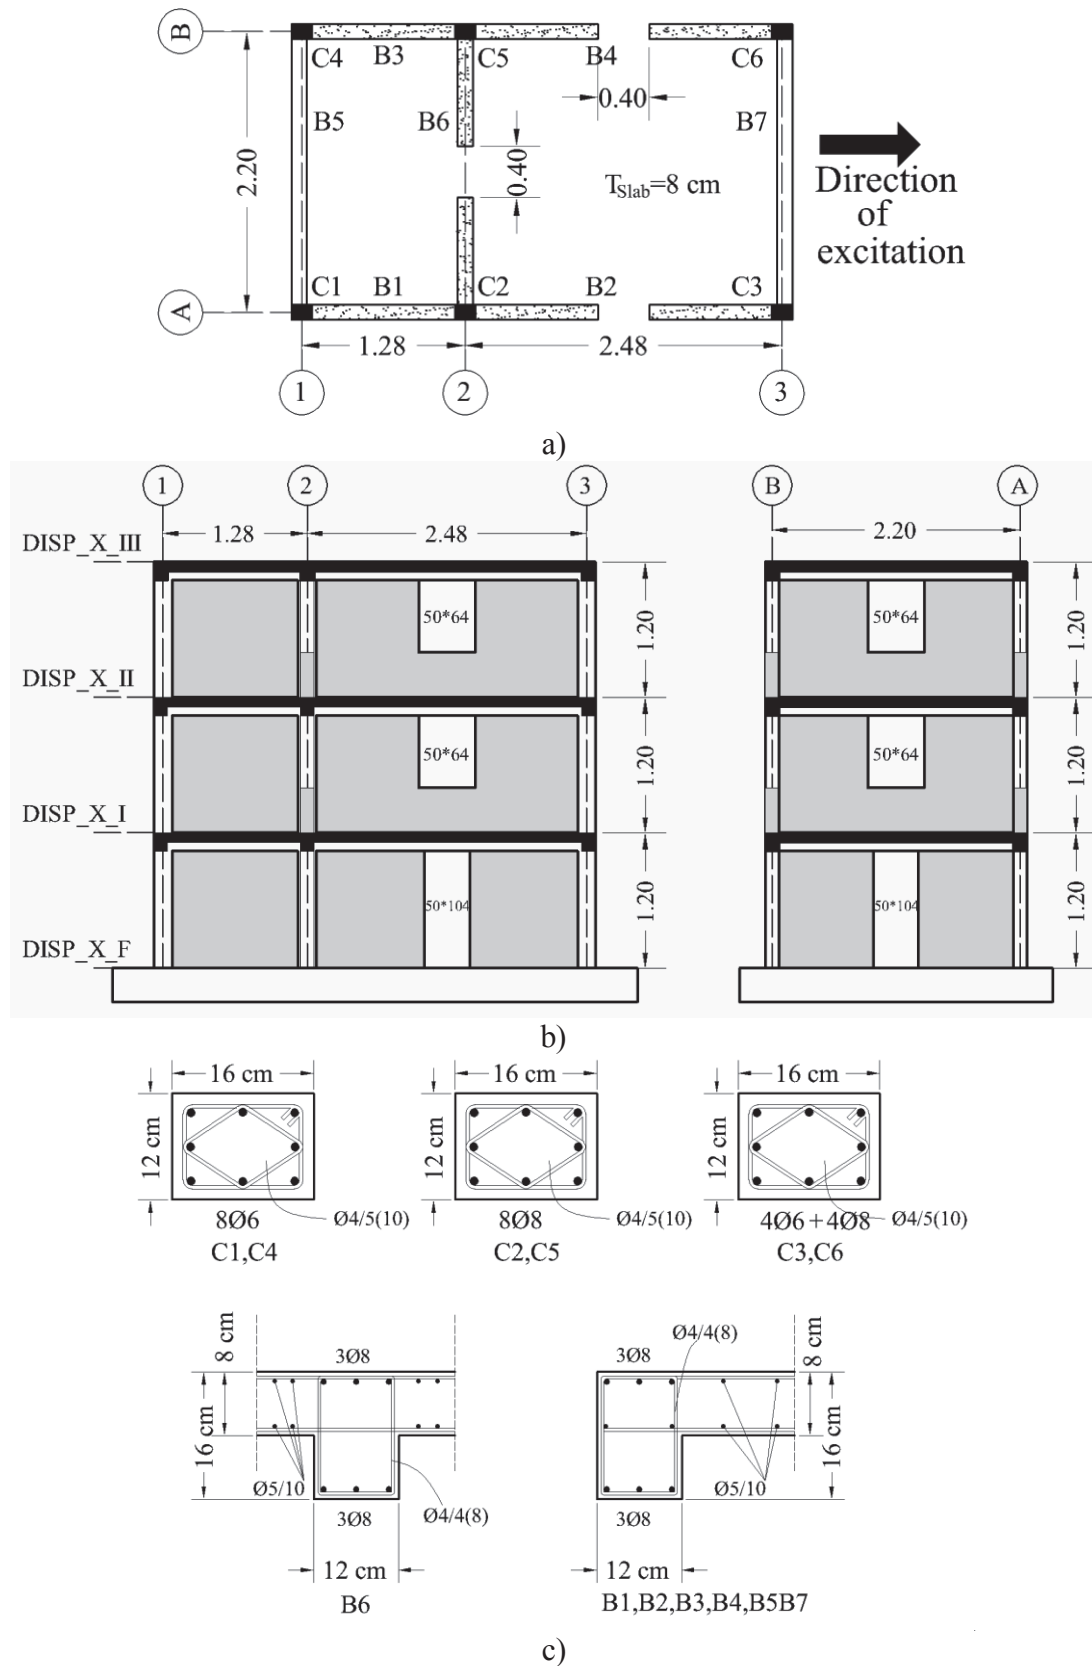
Experimental specimen (*Sigmund et al., 2014*): a) plane layout, b) elevation view, c) cross sections
